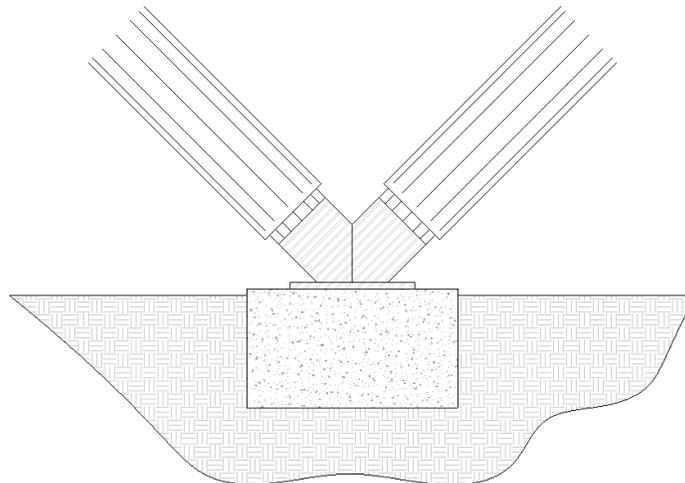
Glued-Wood Fitting with Steel Plates Connected to the Foundation
